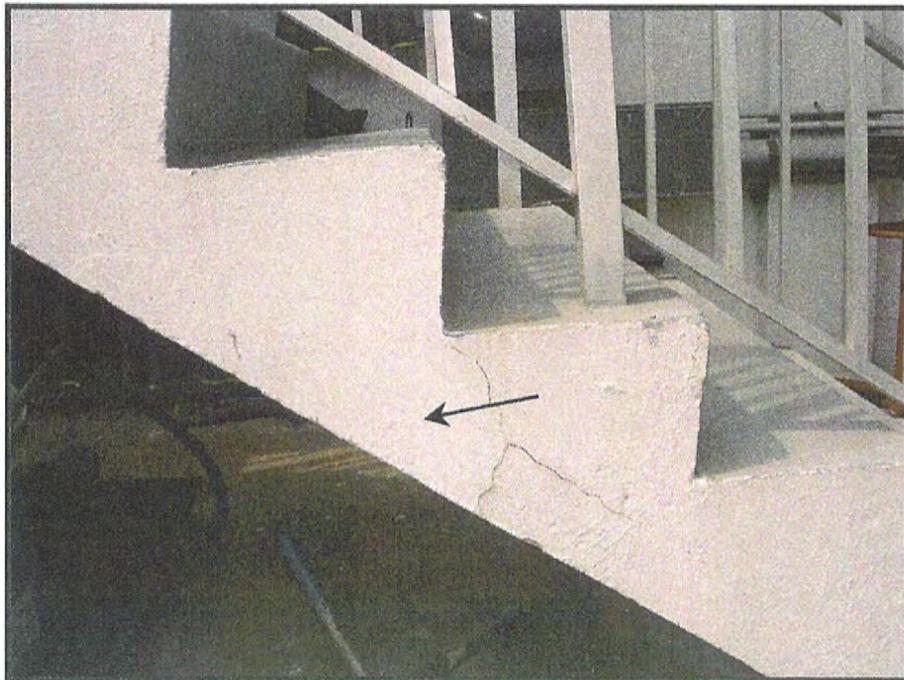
Delaminated concrete along bottom stair run of North exterior stair.
